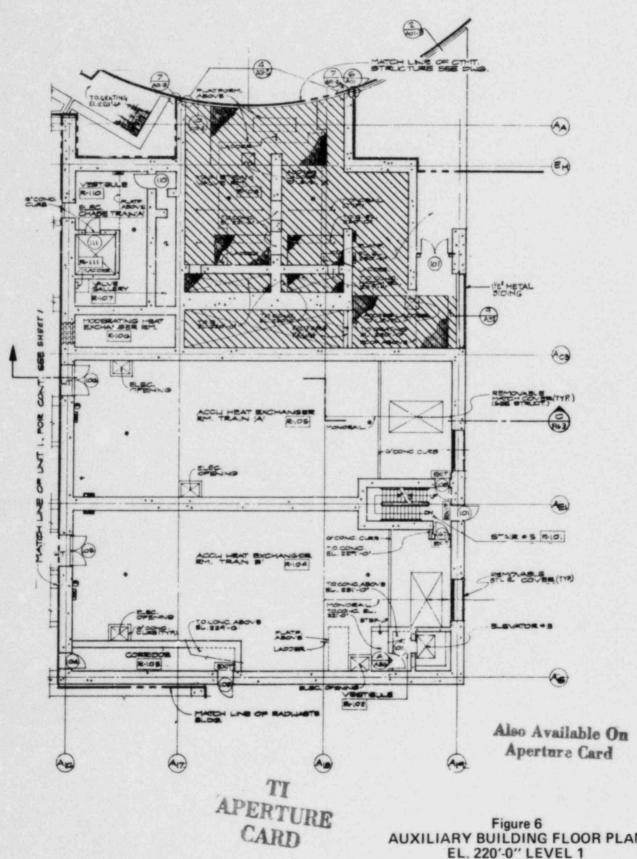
AUXILIARY BUILDING FLOOR PLAN EL. 220'-0" LEVEL 1 (Sheet 2 of 2)
